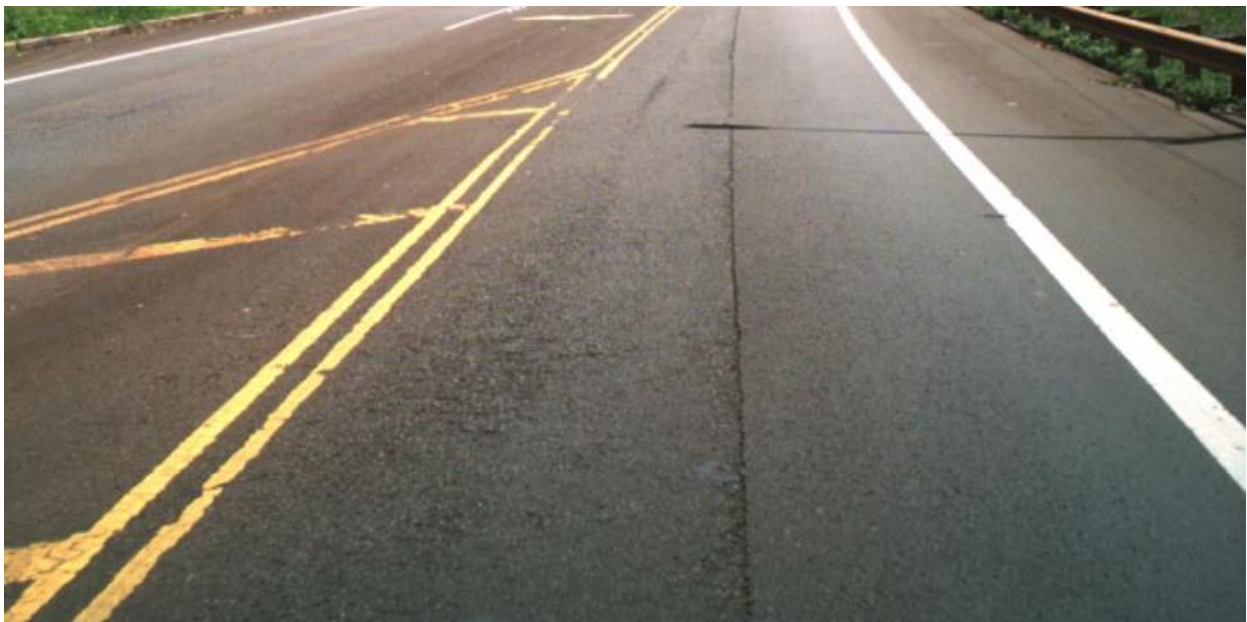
Longitudinal joint and raveling misclassified as fatigue cracking.
